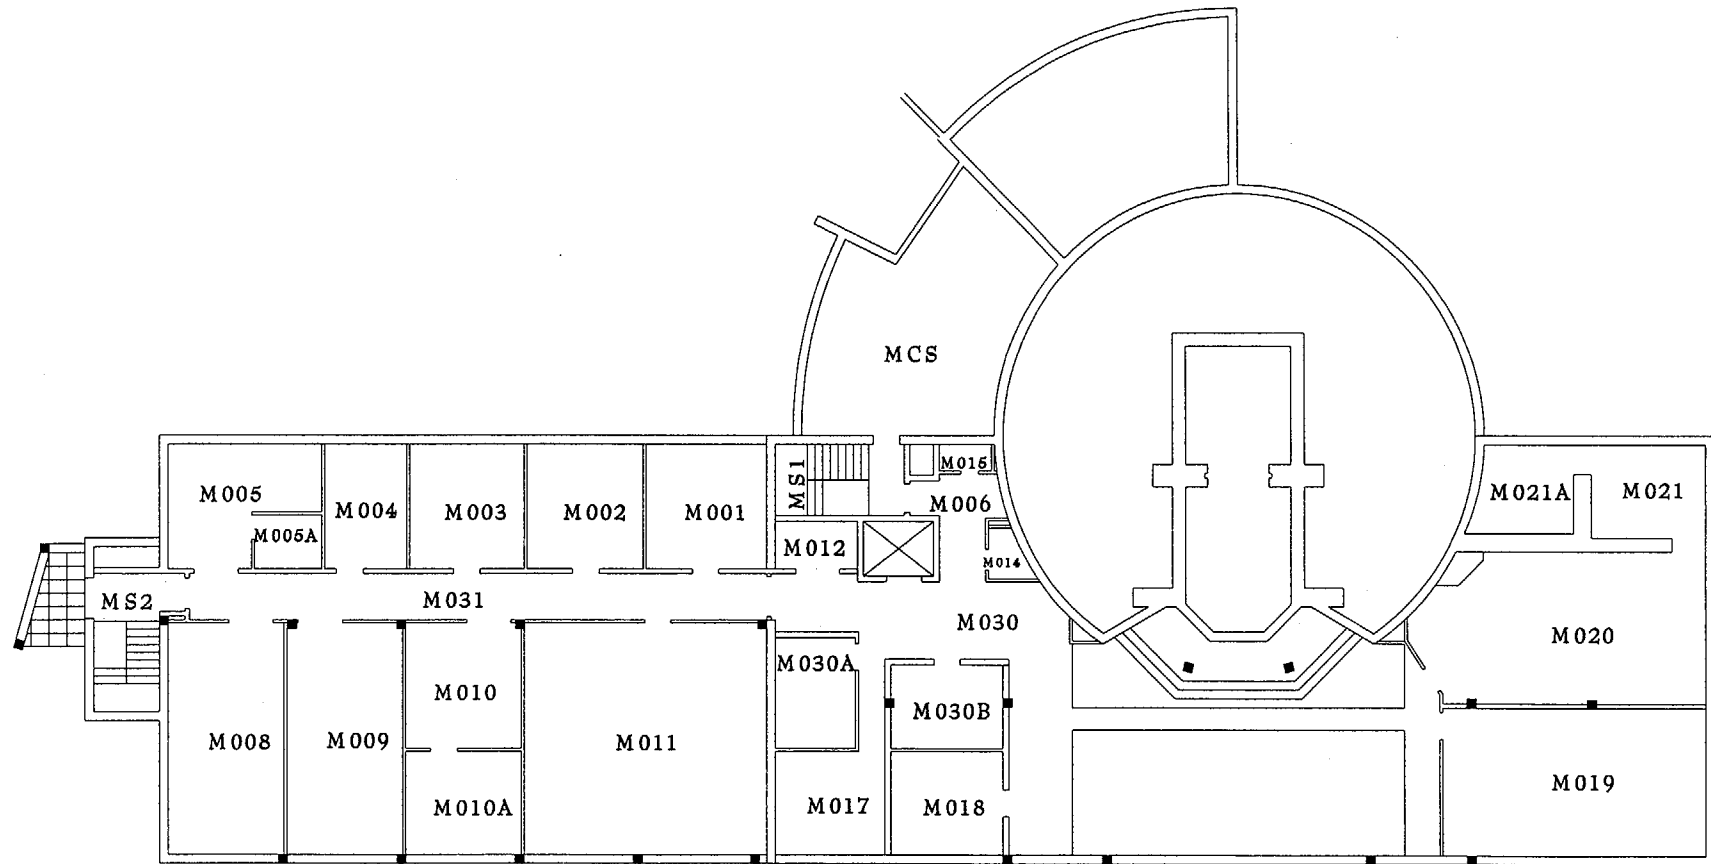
UVA Reactor Mezzanine Floor Plan View
